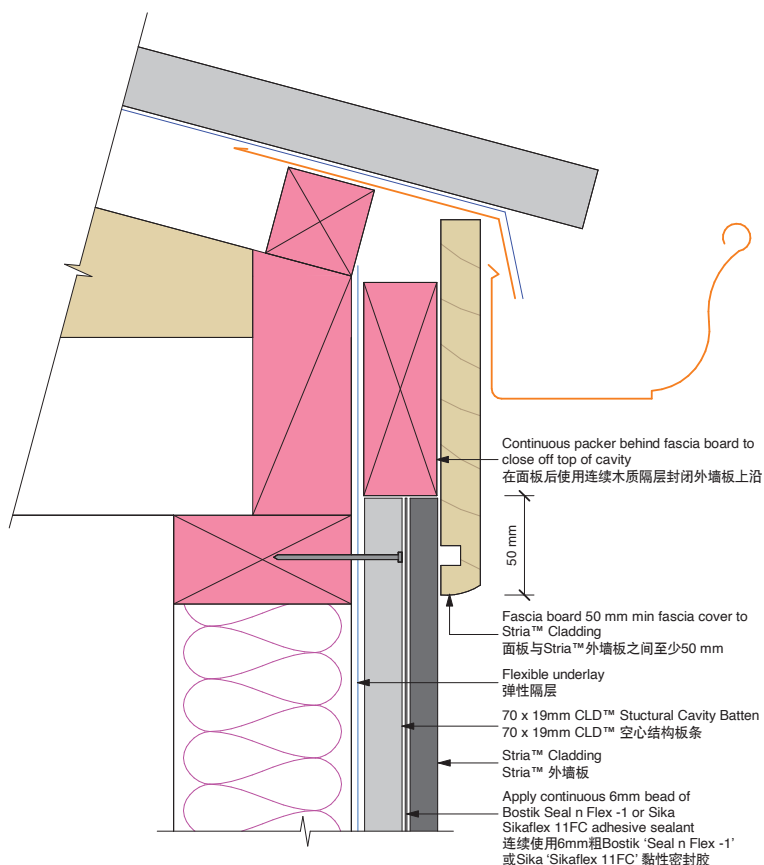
Soffit detail top ventilation | 图15: 拱腹顶部通风详图
